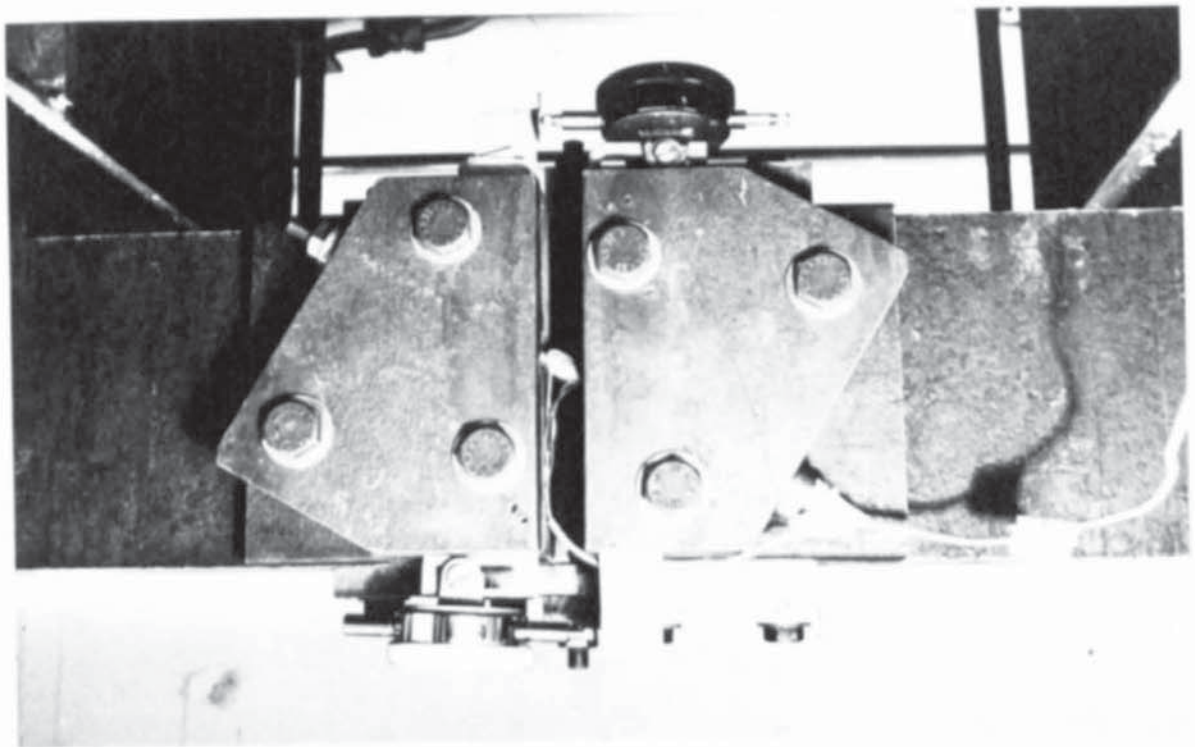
PLAN VIEW, TENSION FACE (STEEL ANALOGUE)
